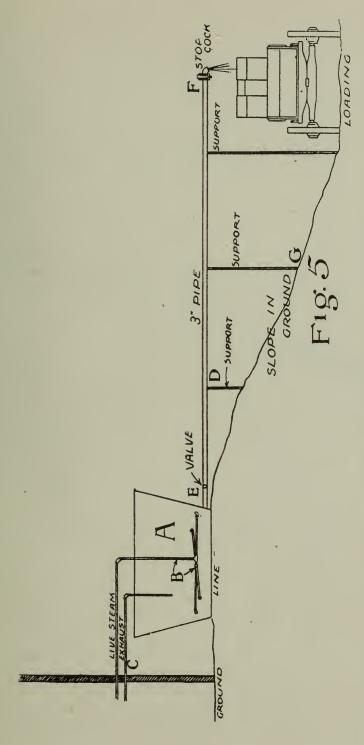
(A) Single tank near boiler; (B) live-steam pipe; (C) exhaust steam; (D) 3-inch pipe to carry whey to loading point; (E) valve; (F) stopcock; (G) sloping ground line. This system used where formation of ground makes it necessary. No pumping.
